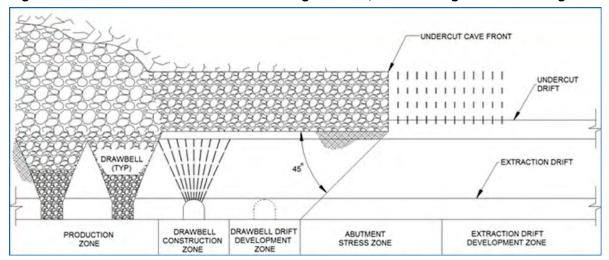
Generalized Cave Section Showing the Cave, Undercutting and Drawbelling
